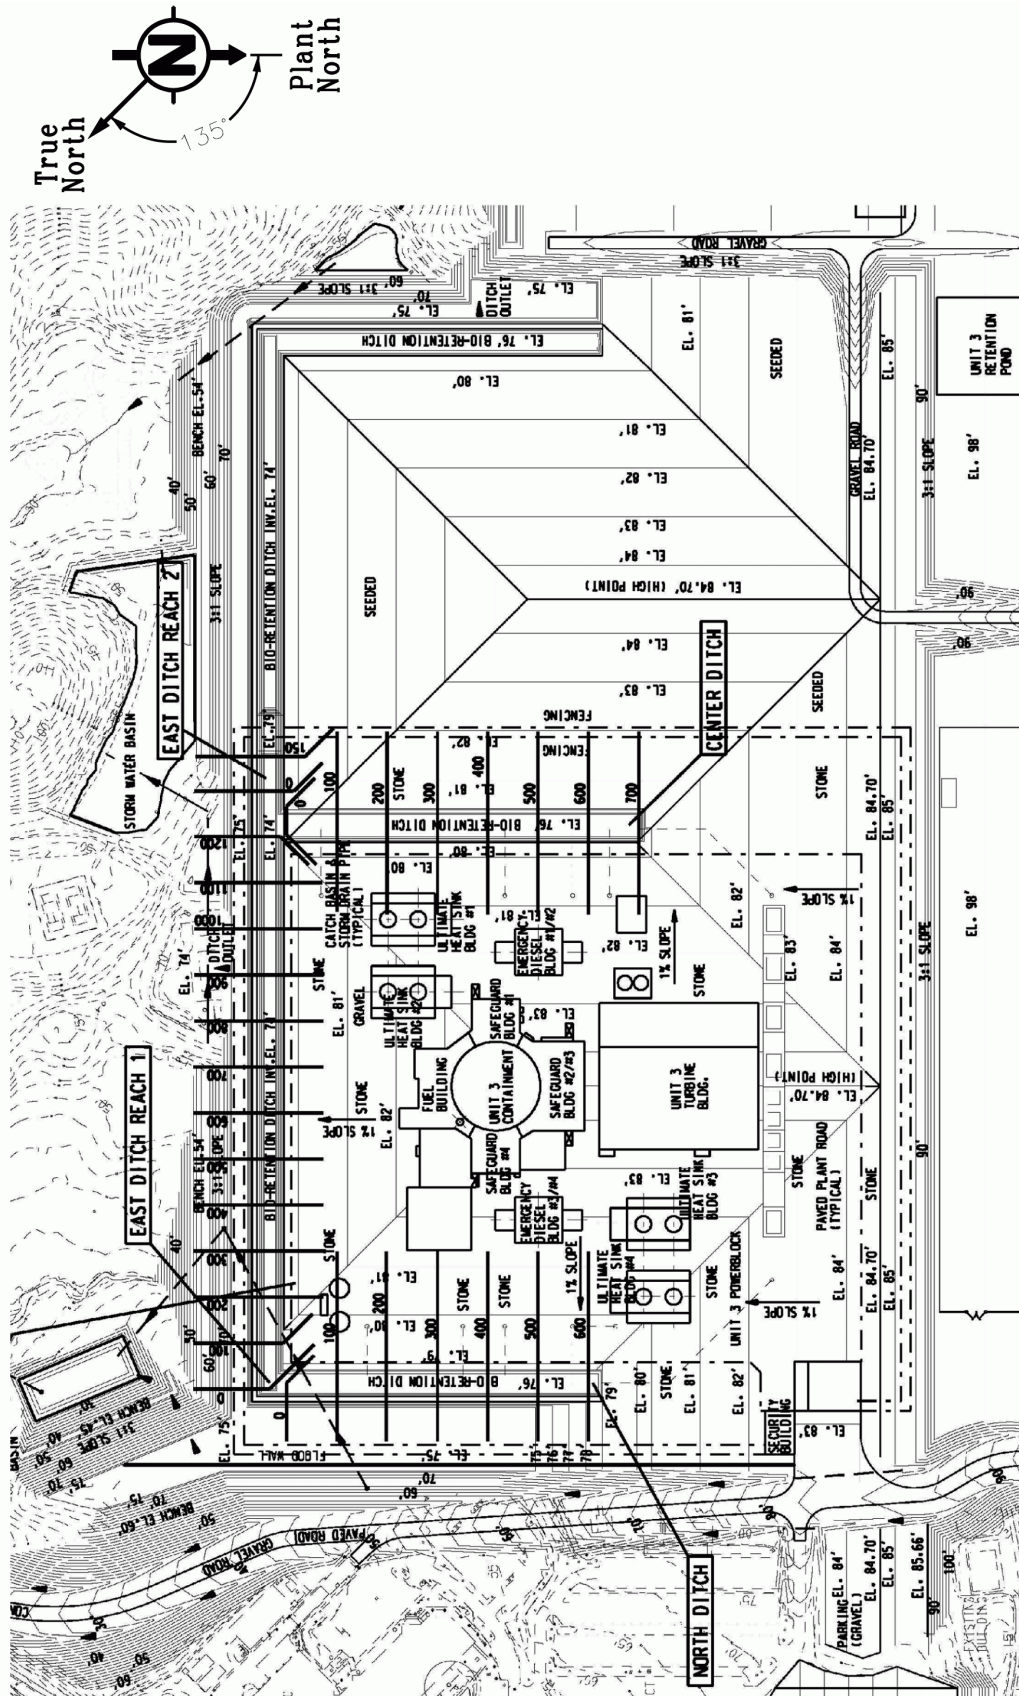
{CCNPP Unit 3 Drainage Ditch Cross Sections}
